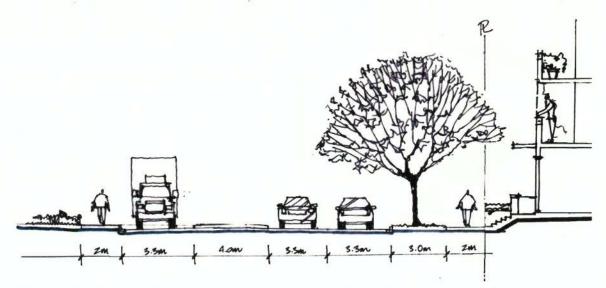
Illustrative Section across Esquimalt Road (Illustrating minimum streetscape widths)
